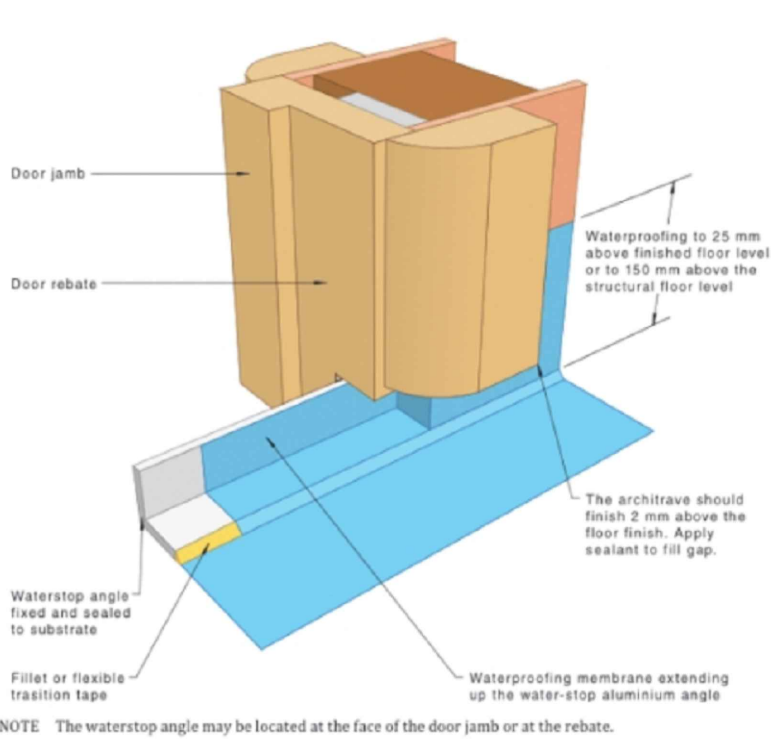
(A) — Example of liquid waterproofing at door opening framework
